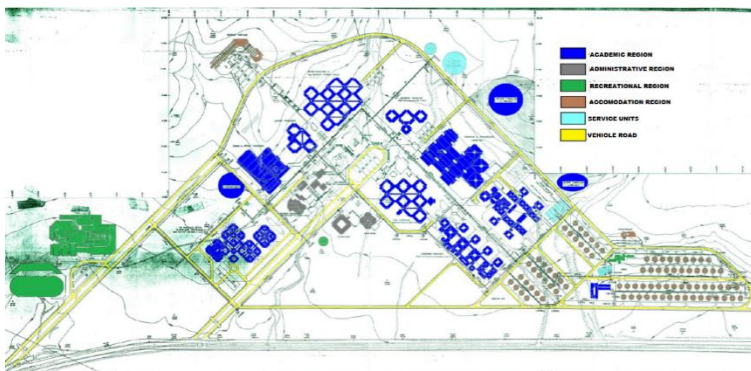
General layout plan of S. U. Alaaddin Keykubat Campus 1984. Source: Archive, 2011.
